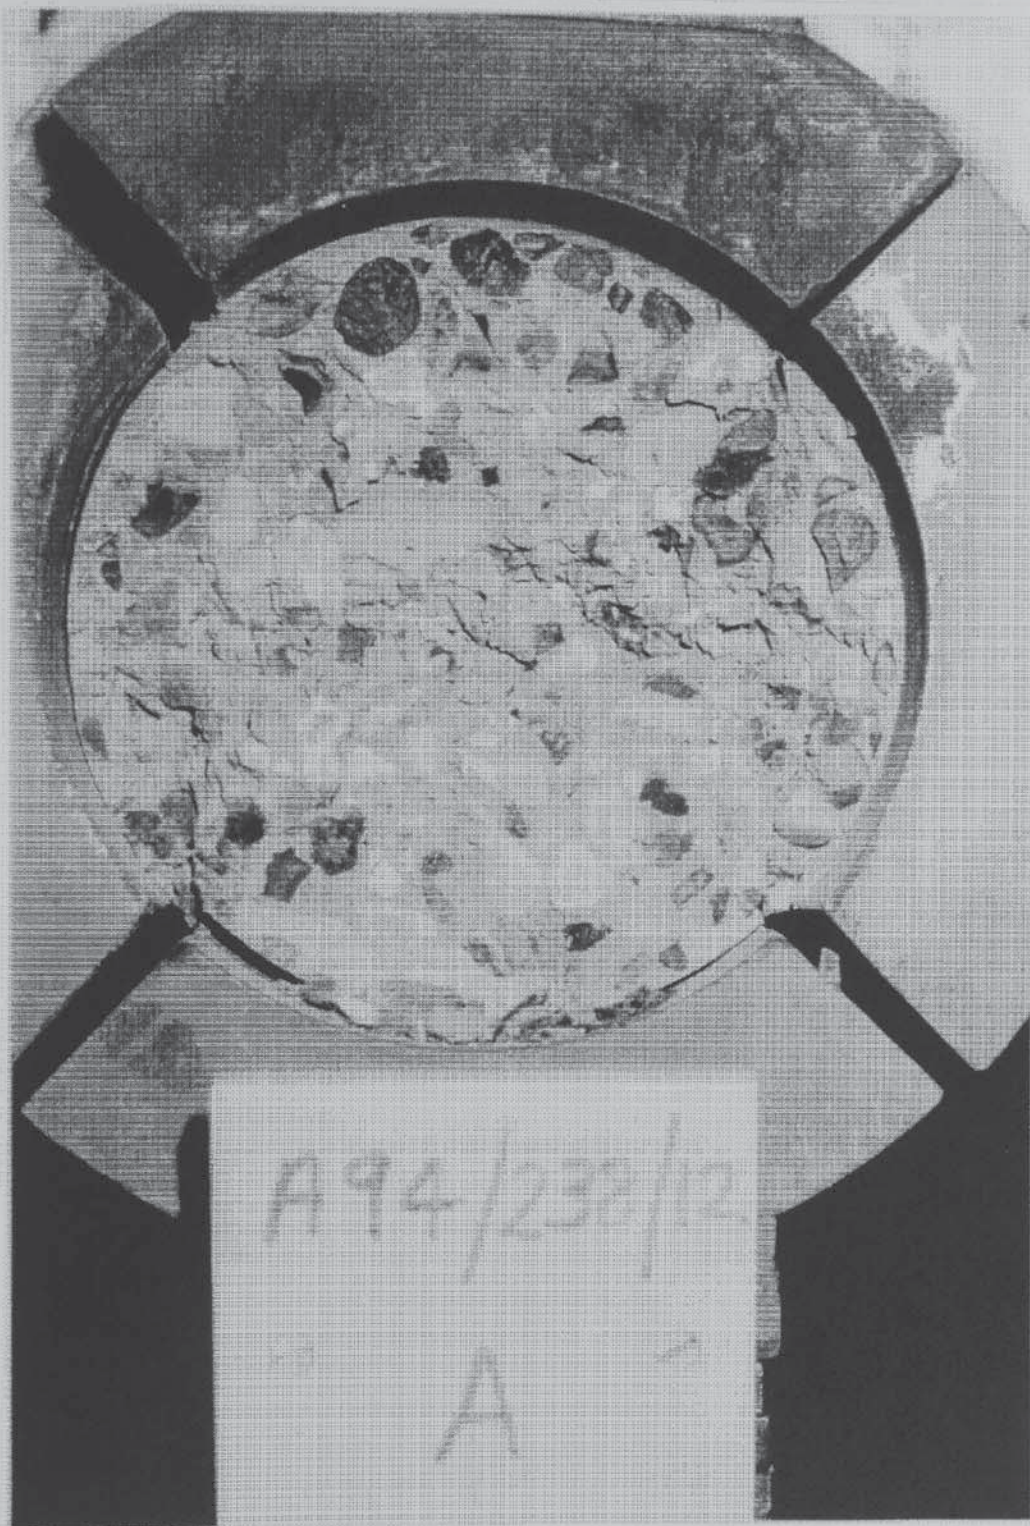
Explosive spalling over entire surface of specimen
